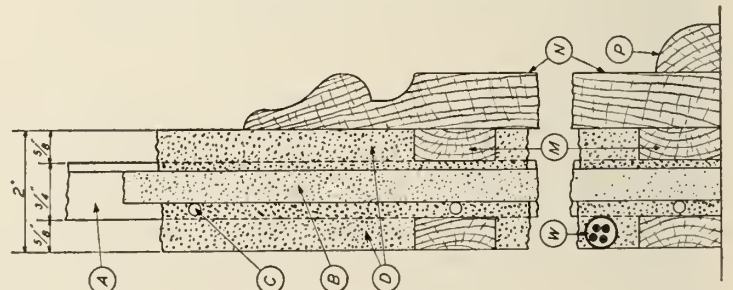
DOOR BUCK DETAILS. (Showing method of attaching T-Iron).
